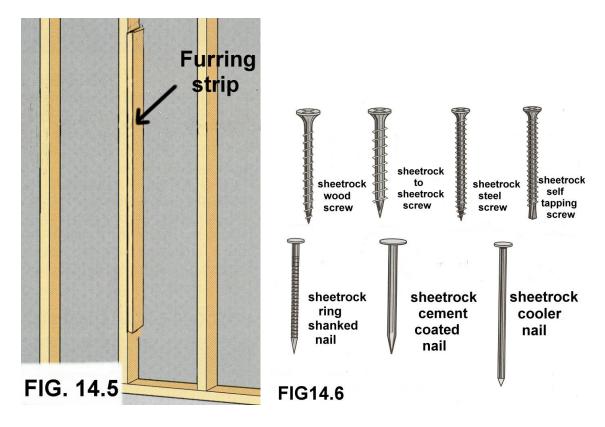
shows a wall that is shimmed with a furring strip so there is adequate nailing room on the wall stud. Figure 14.6 shows the different kinds of nails and screws.
